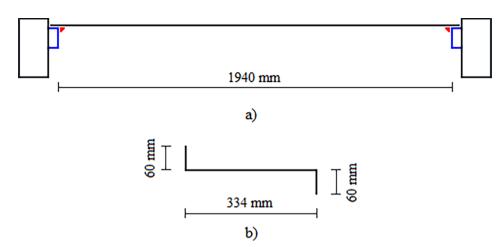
Step geometry: (a) longitudinal section, (b) cross-section.
